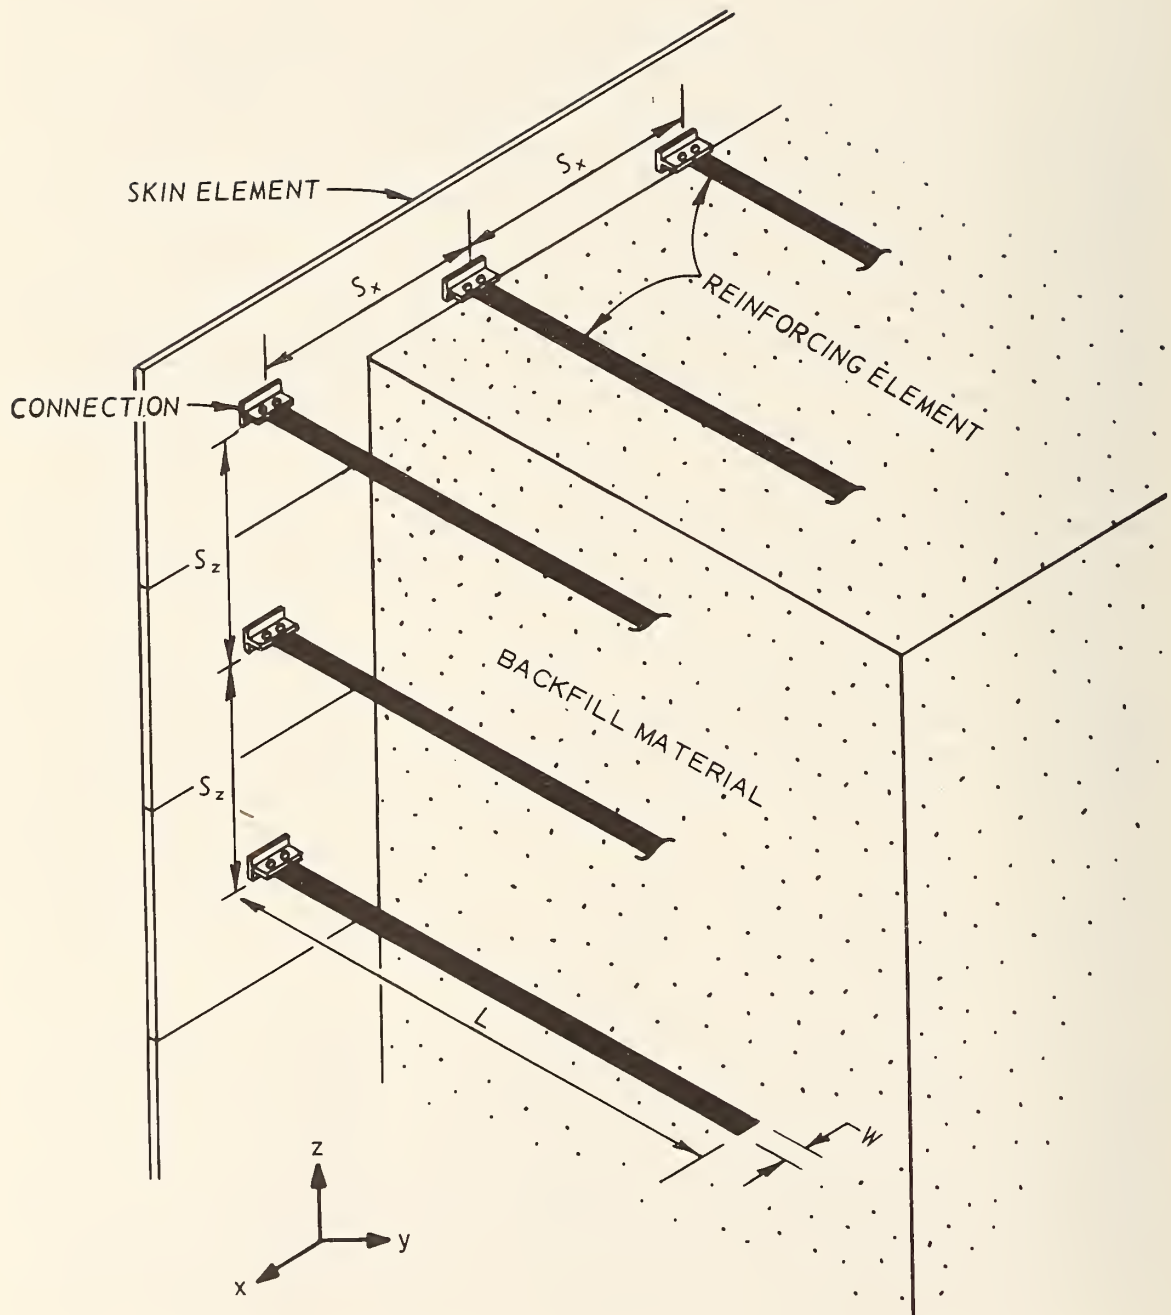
Schematic of major elements of reinforced earth wall (Al-Hussaini and Perry, 1976)
